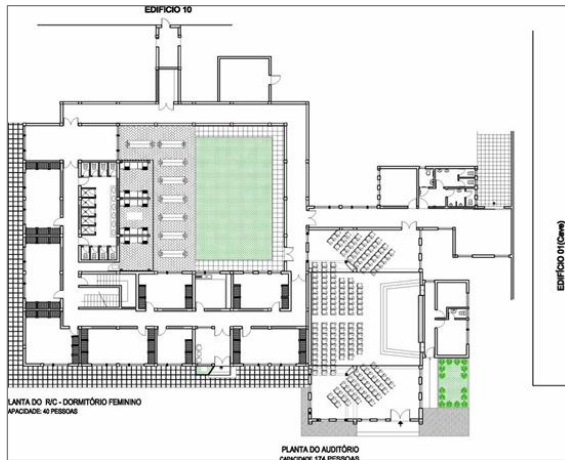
Health Training School, Maputo. Female dorm building – Ground Floor plan
